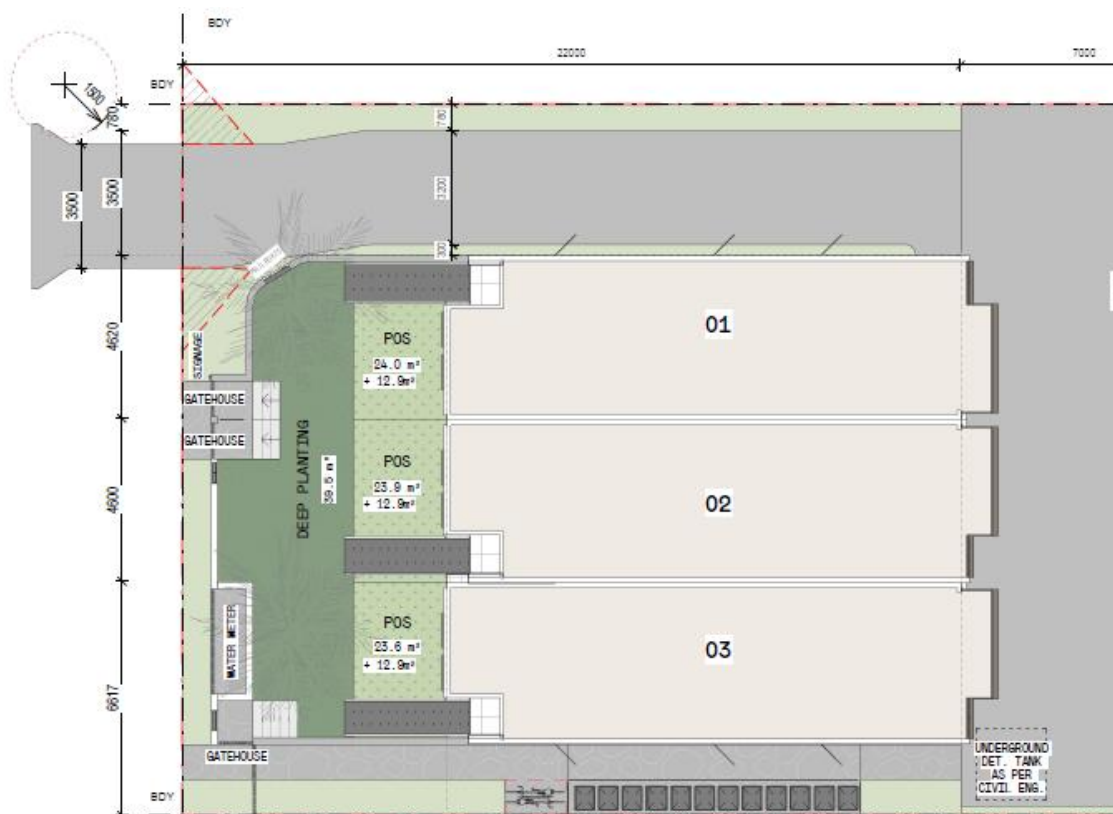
Proposed Site Plan with Increased Setback to Front Walls – Zarchitects (8 June 2026)
